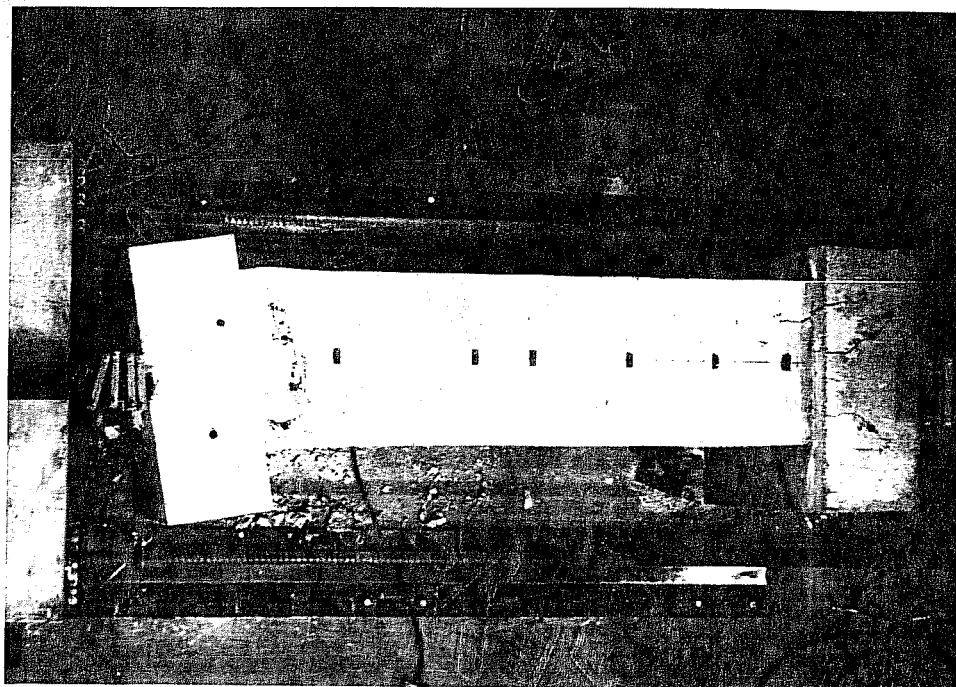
Typical Failure in 1200 kip Testing Machine
